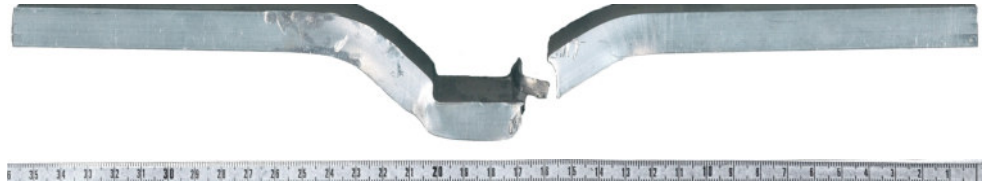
Removed fastener after testing: back side of aluminium fastener in beech LVL.
